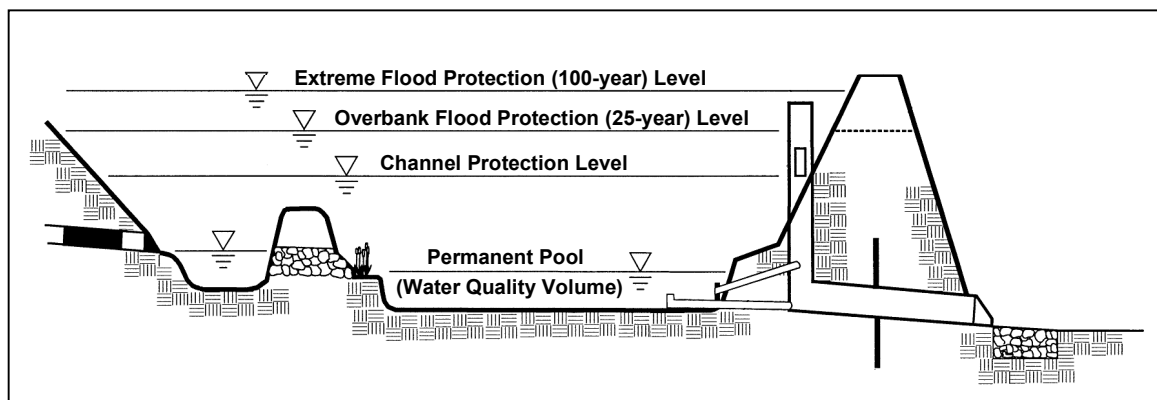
Unified Sizing Criteria Water Surface Elevations in a Stormwater (Wet) Pond
